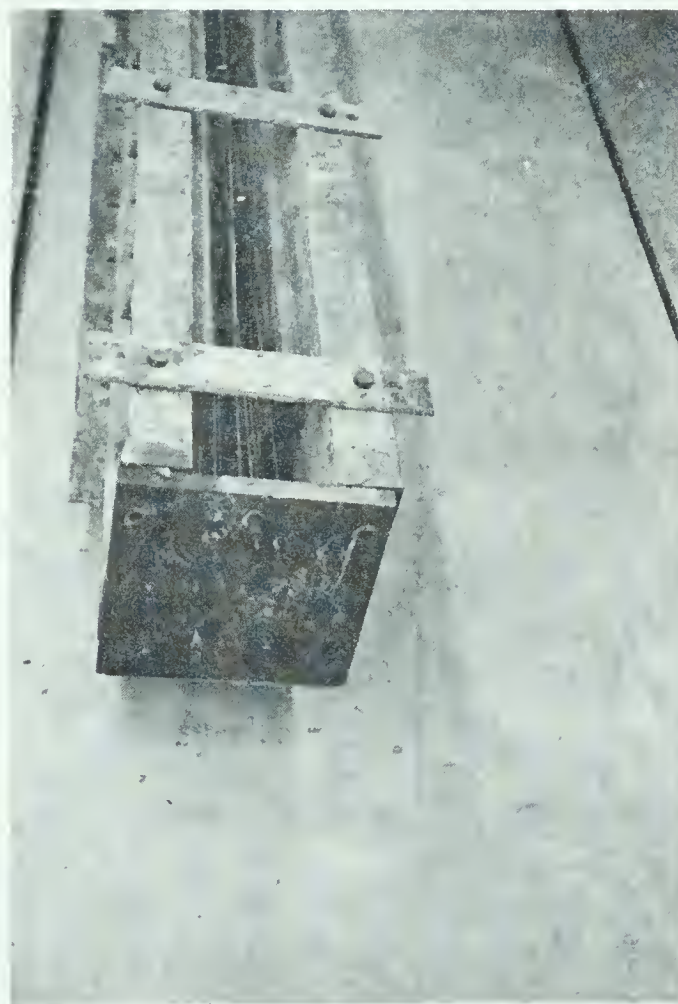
FIG. A-I FORM ASSEMBLY FOR PRETENSIONED BEAM
